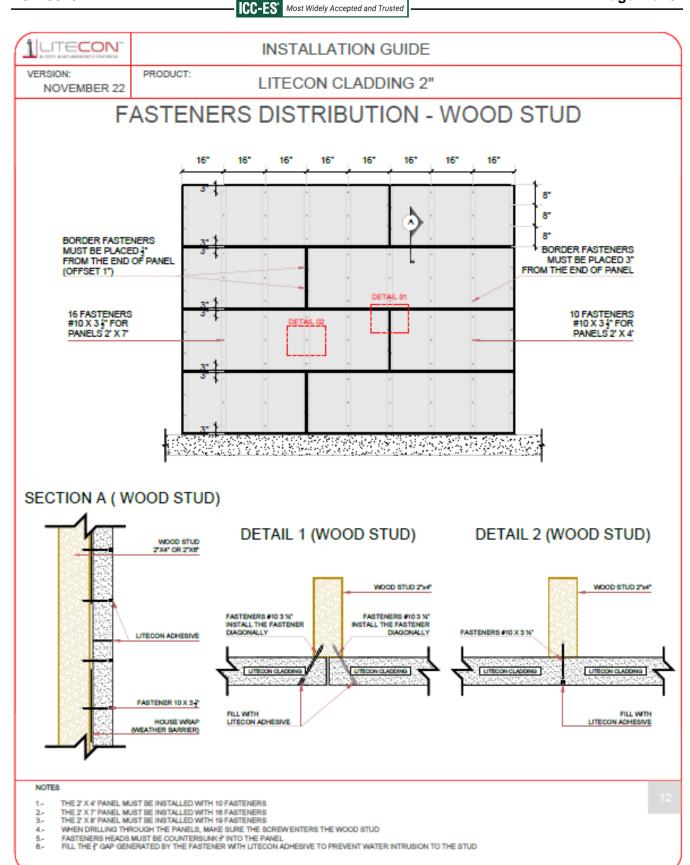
TYPICAL INSTALLATION PAAC PANELS ON LIGHT-FRAME STRUCTRE
